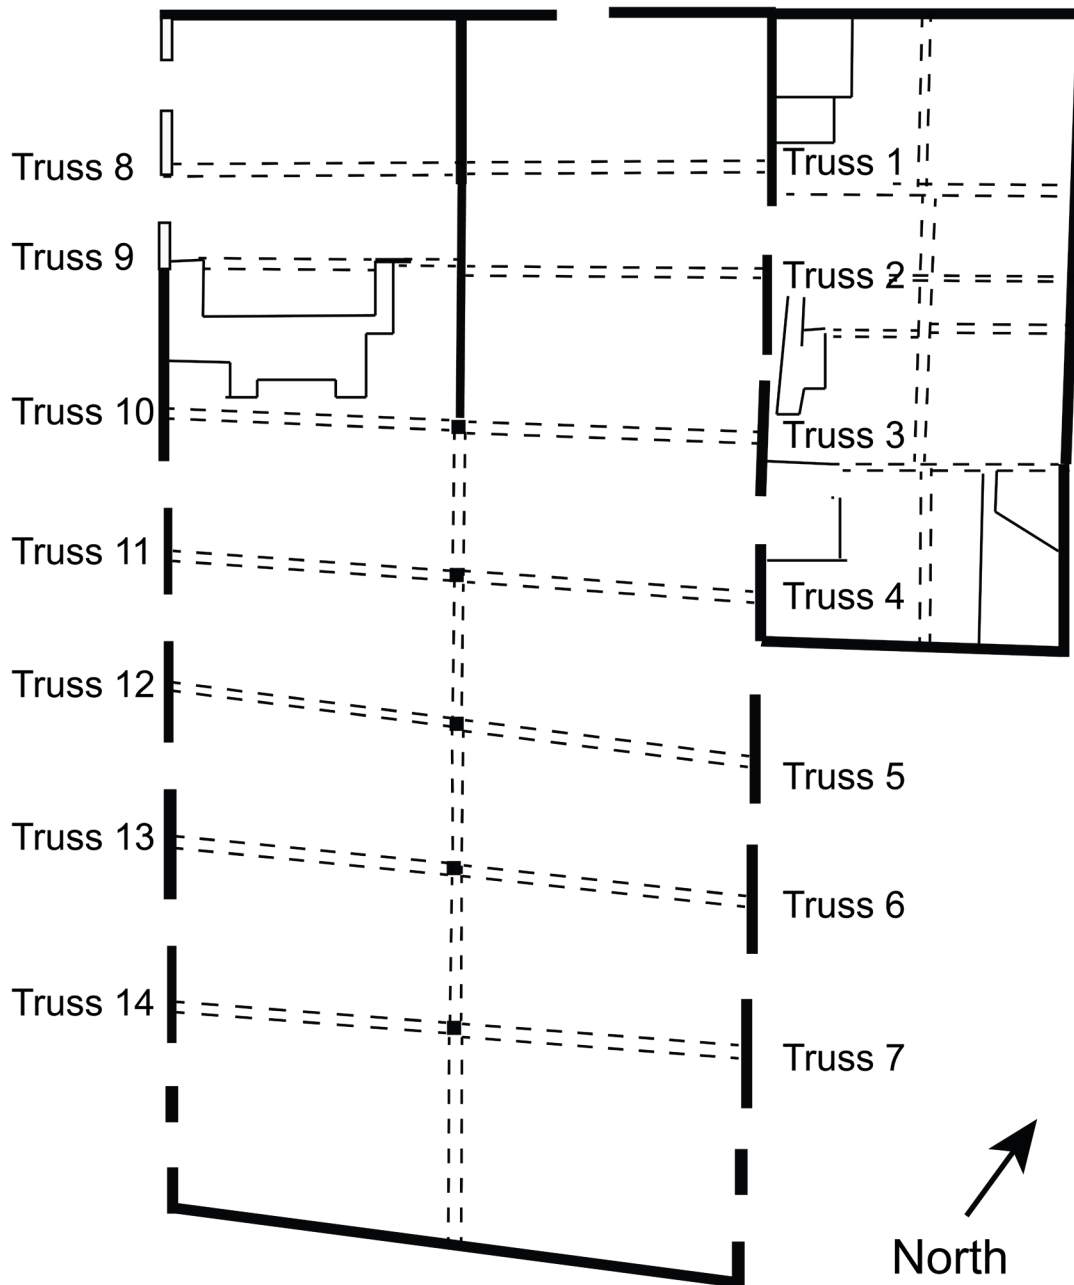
Merchant Adventures Hall first-floor plan showing truss numbering used in this report (drawing by P Marshall)
